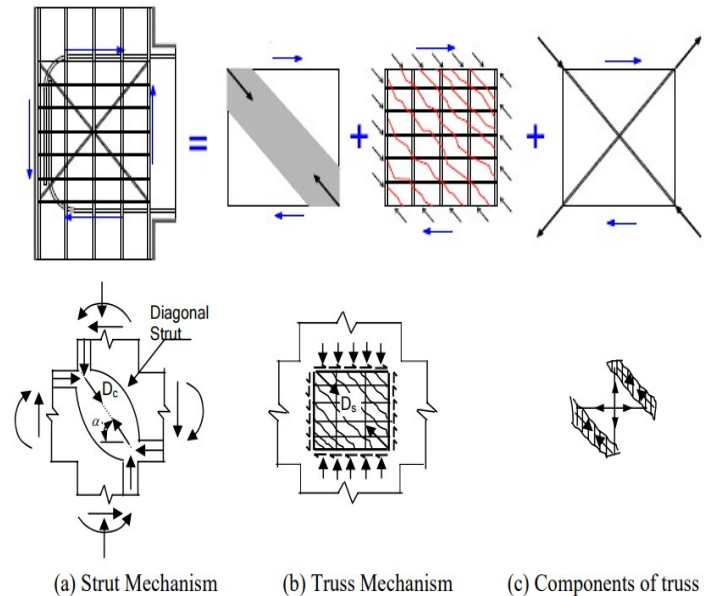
Shear force transfer mechanisms in a joint with crossed inclined reinforcement bars
